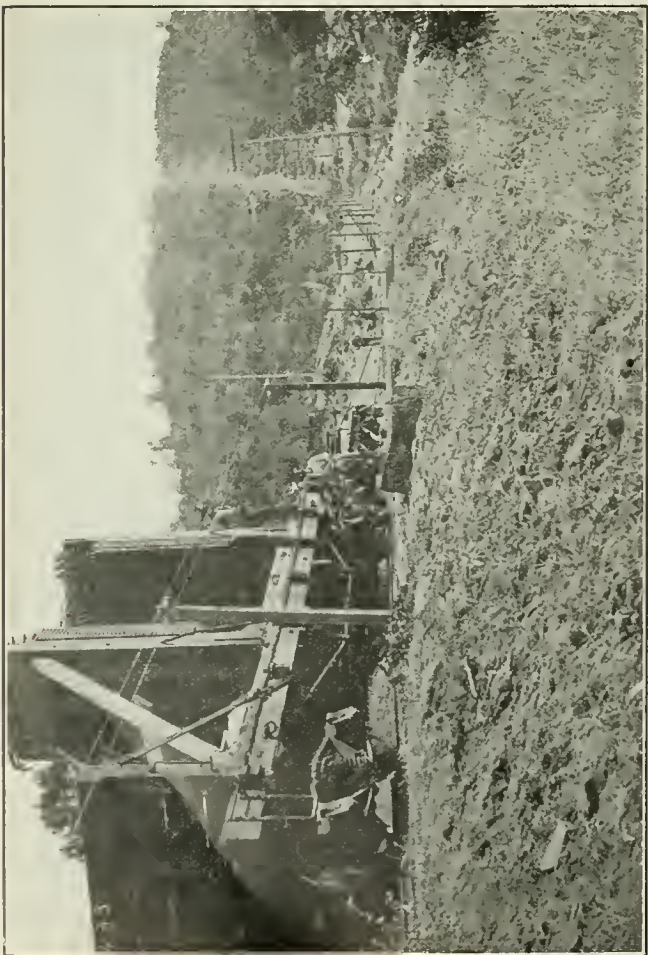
HALF OF STATOR FOR 25,000-Kw. GENERATOR AT BIG CREEK POWER HOUSE NO. 3 BEING LOWERED ON INCLINE TO POWER HOUSE SITE
